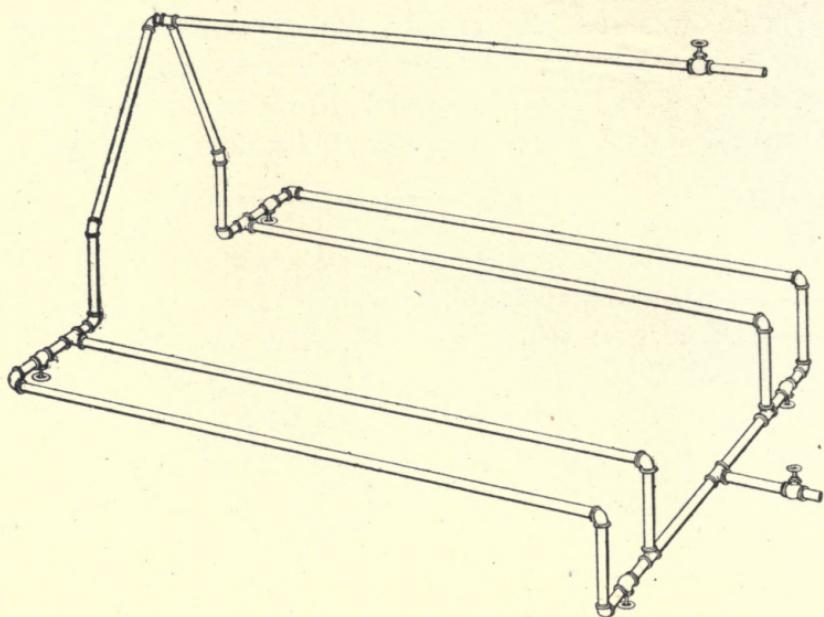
Connections of Outer Groups of Pipes of Greenhouse Shown in Fig. 175.
